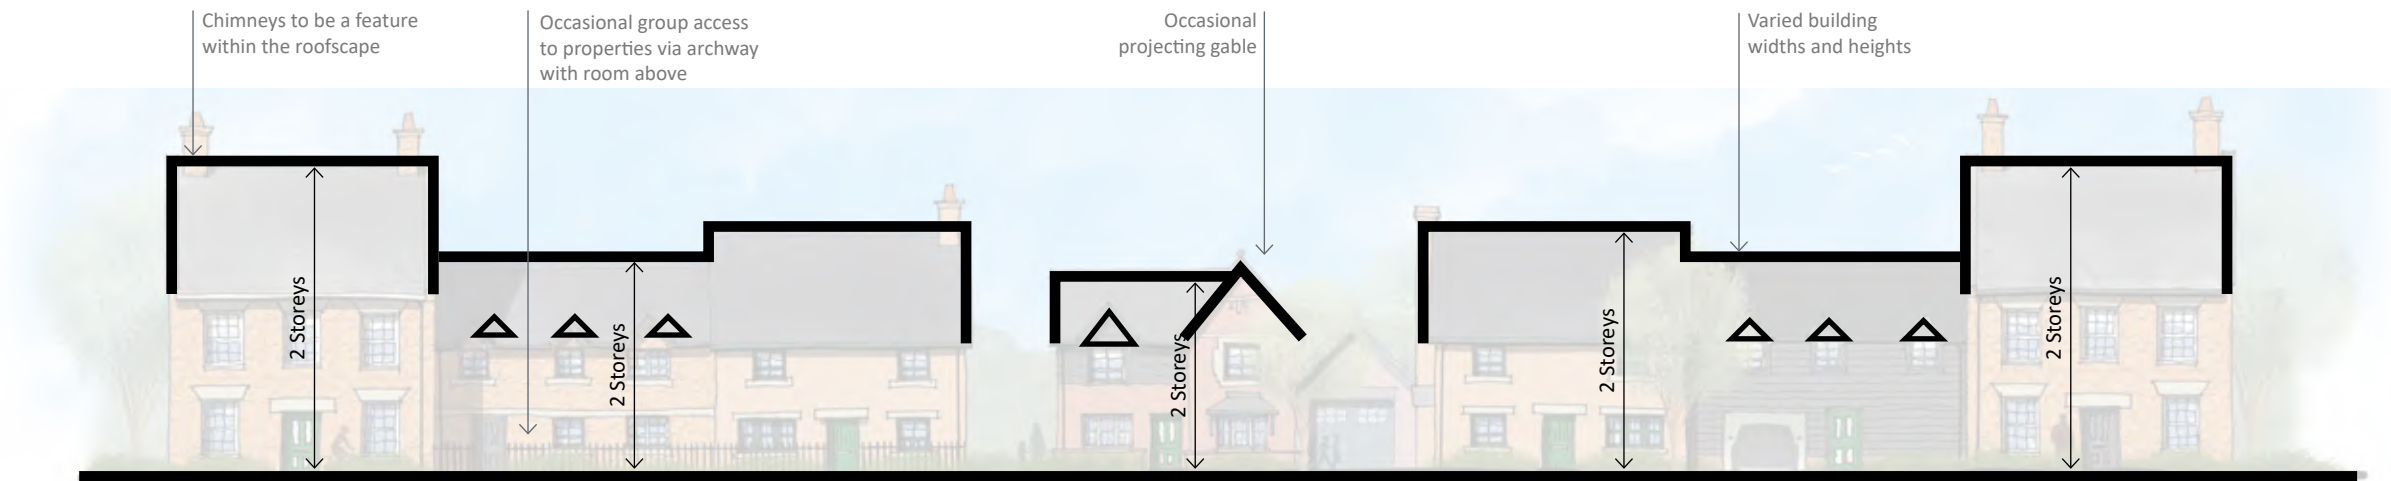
'HOT' STREET ELEVATION PRINCIPLES
